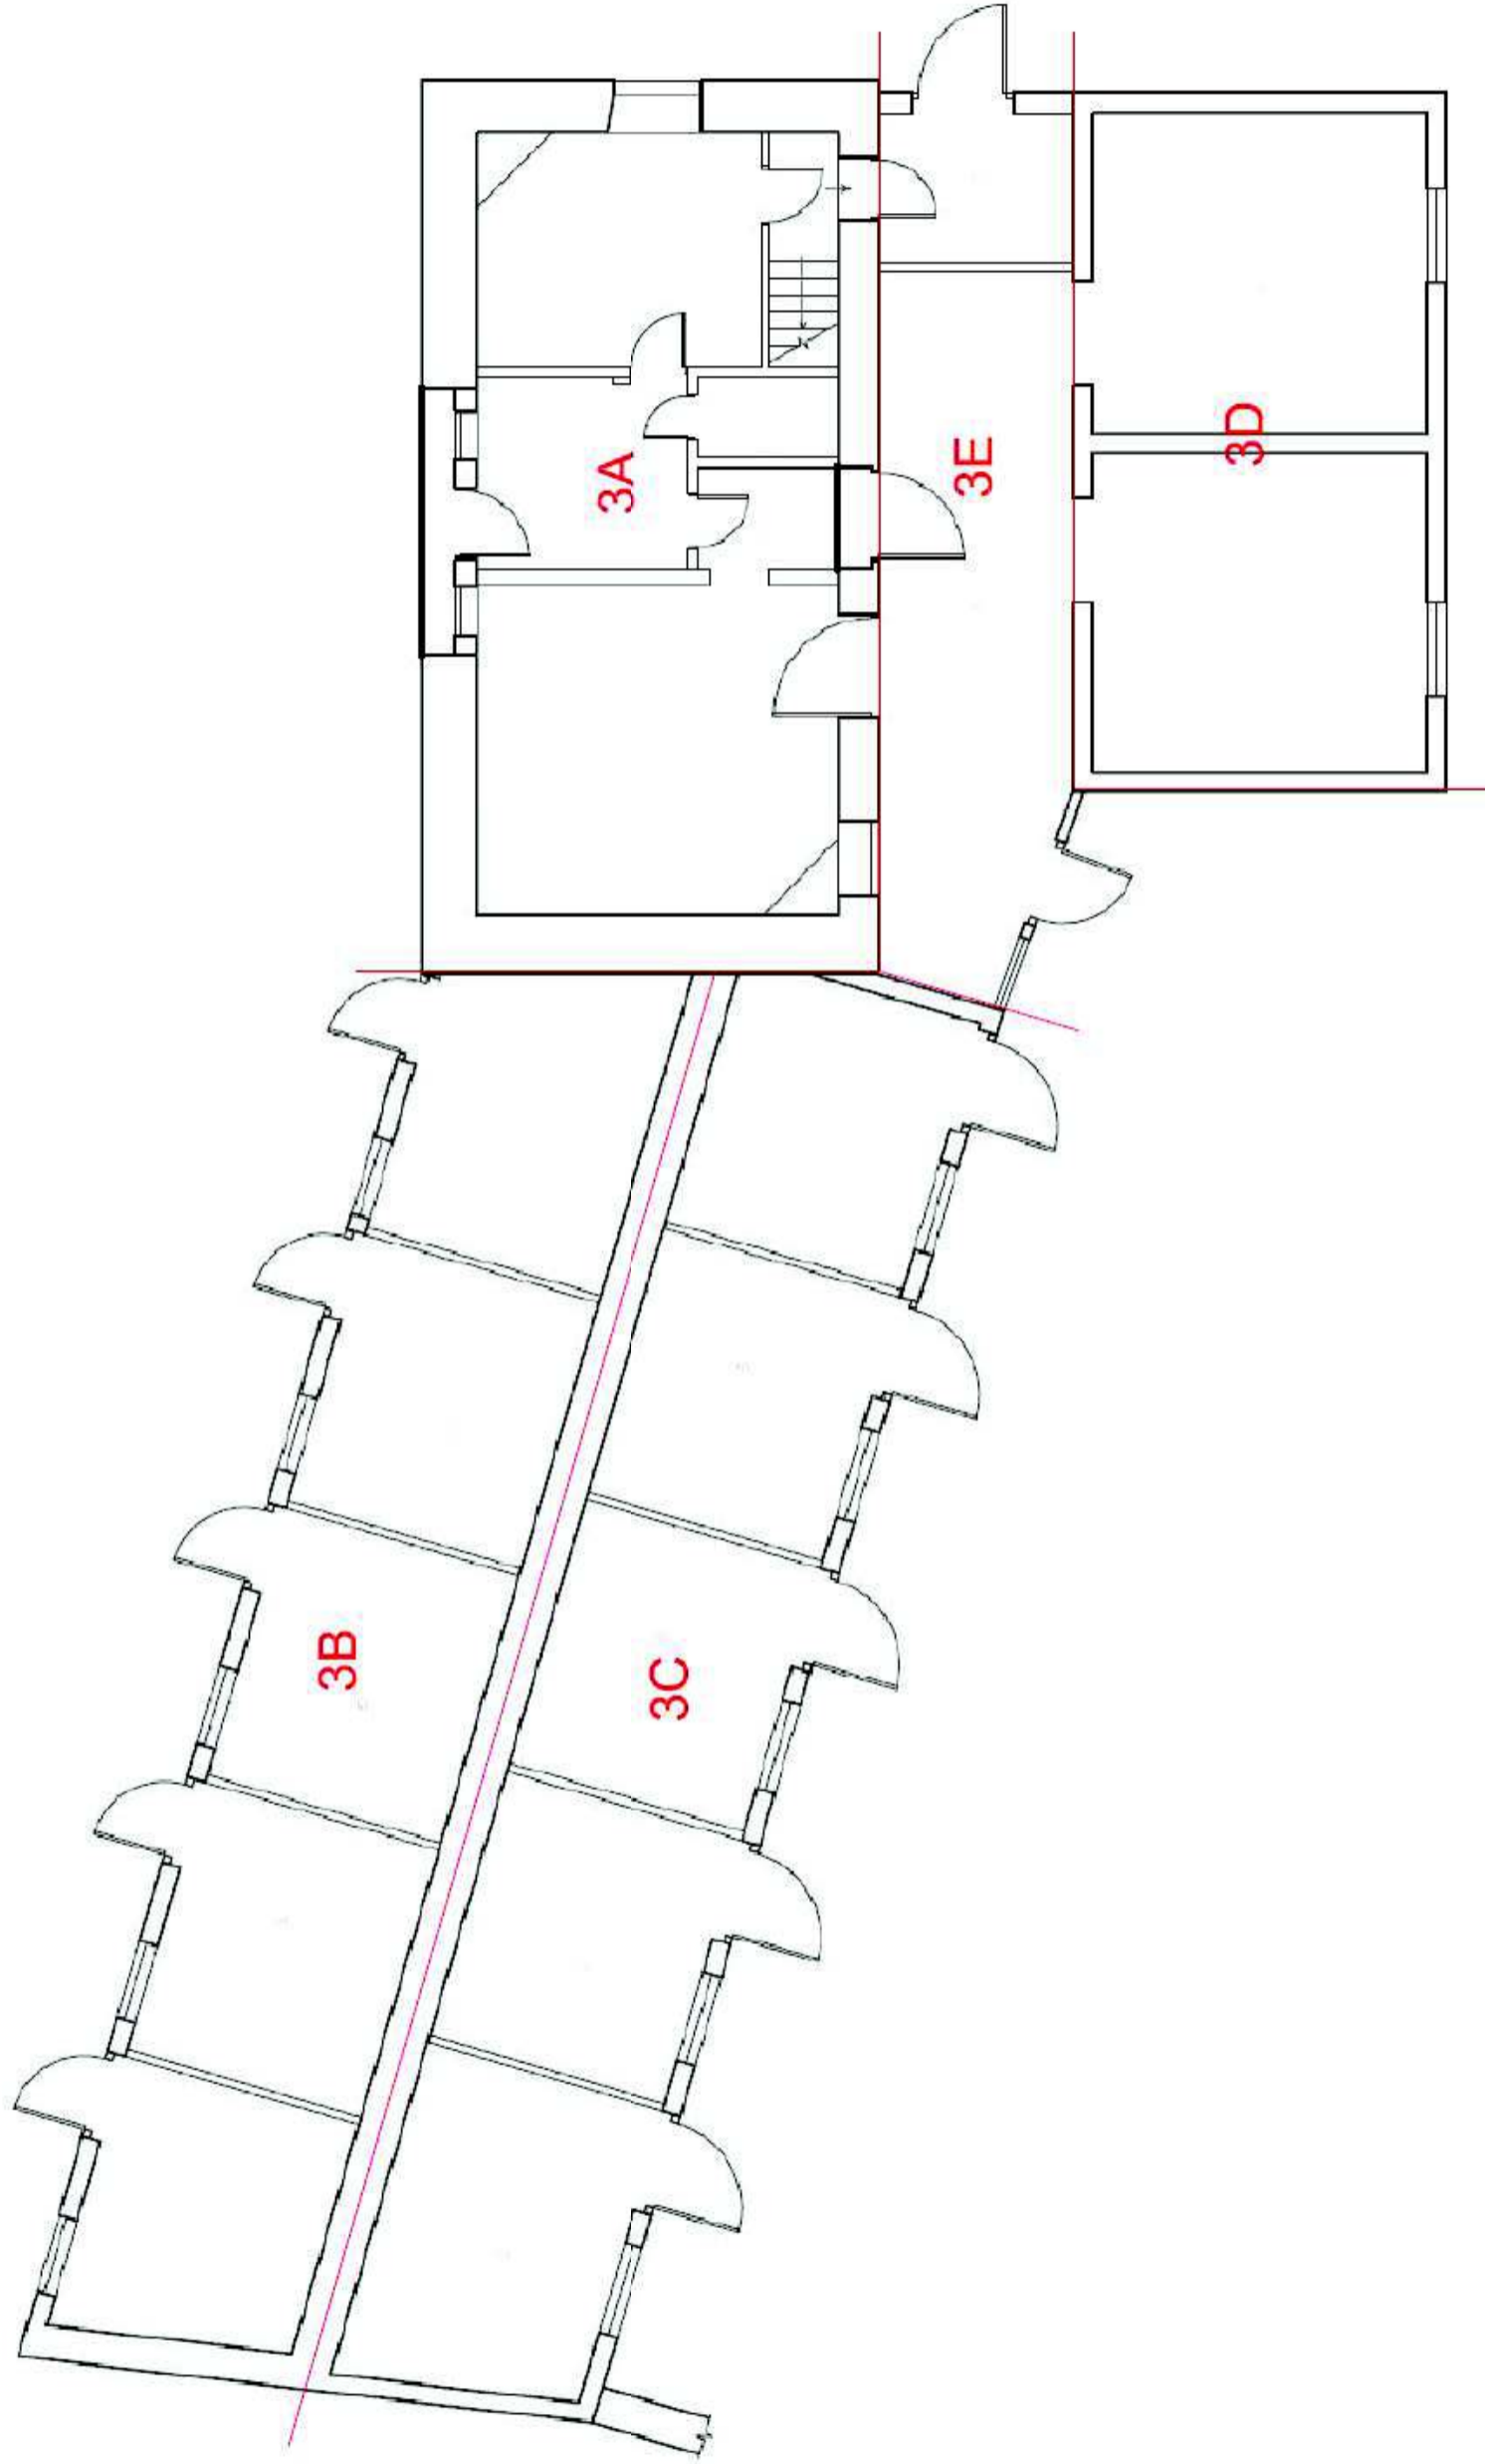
Ground Floor Plan, building 3, 1:100 @ A3
